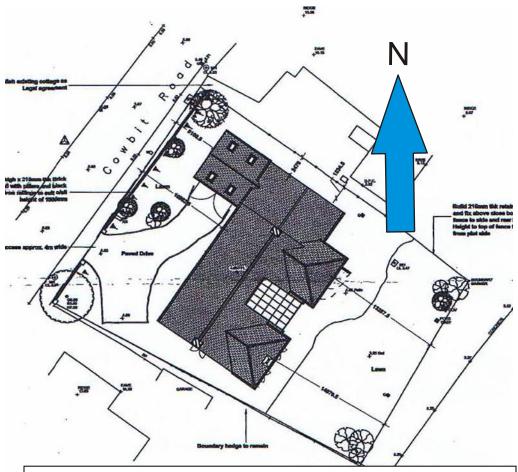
Block plan showing original proposed site layout at an original scale of 1:250, (not to scale), (extract from Architects plan)
